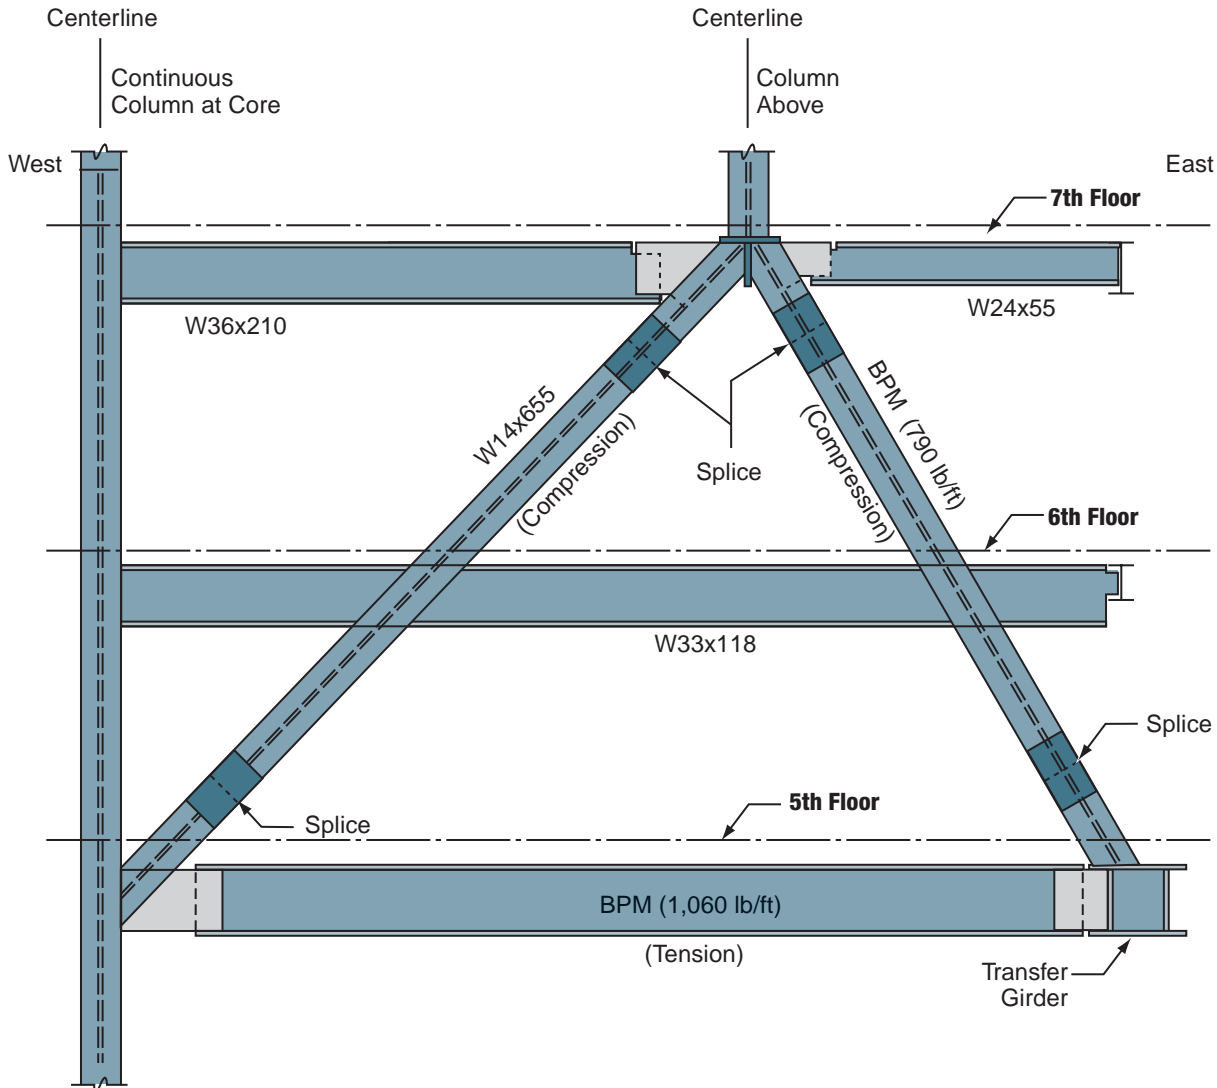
Truss 1 detail. (BPM = built-up plate member.)
